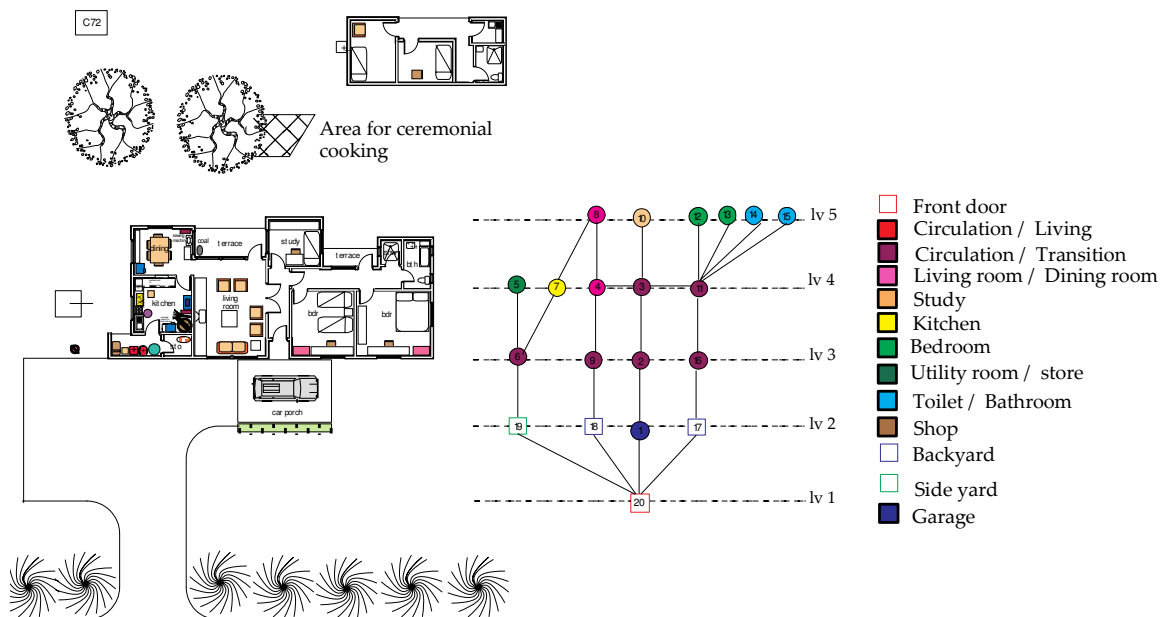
Floor plan of a modern detached house and j-graph mapped with space labels (Source: Ekundayo 2007)
